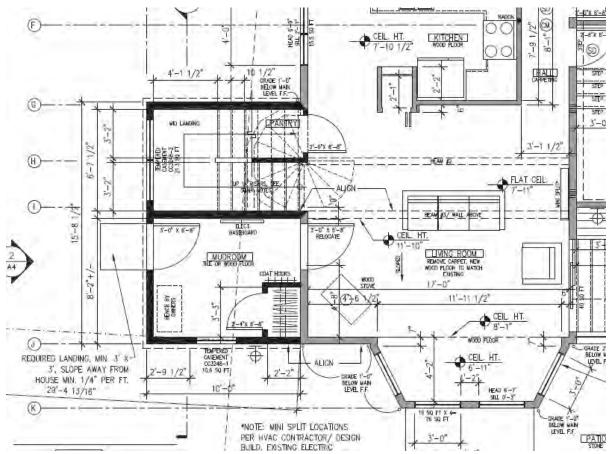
Detail view of interior layout for the proposed staircase and mudroom addition to the western façade of the residence.
